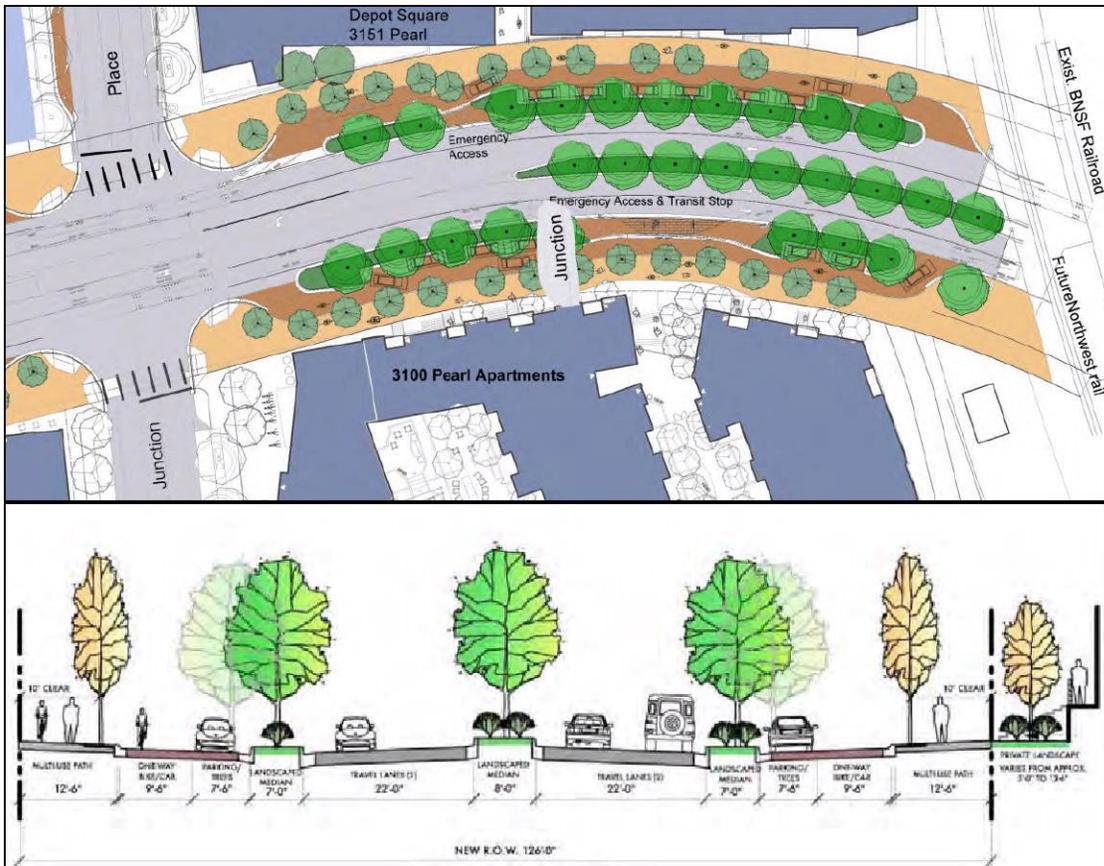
Figure D – Plan and section views of proposed Pearl Parkway “multiway” boulevard
